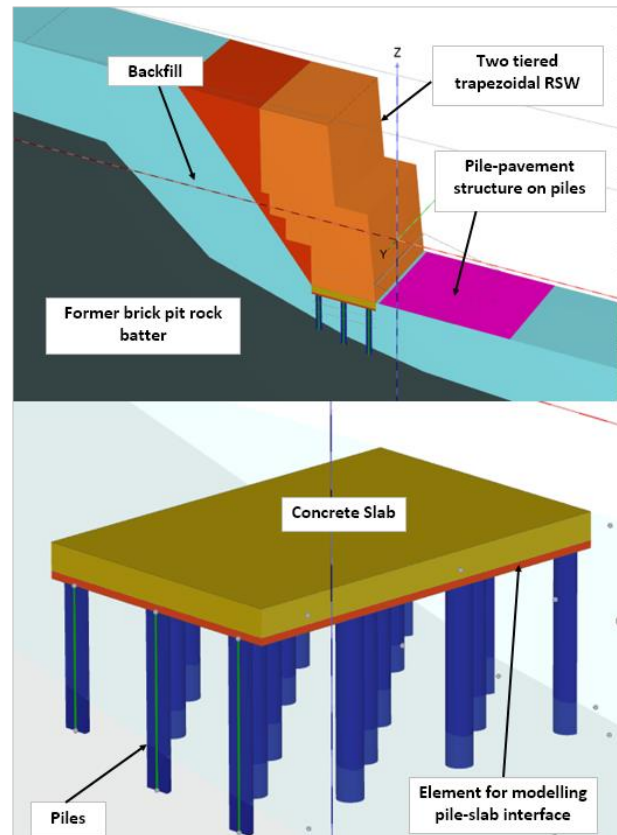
Plaxis 3D model developed for the trapezoidal RSW and foundation. Interfaces have been switched off for clarity.
